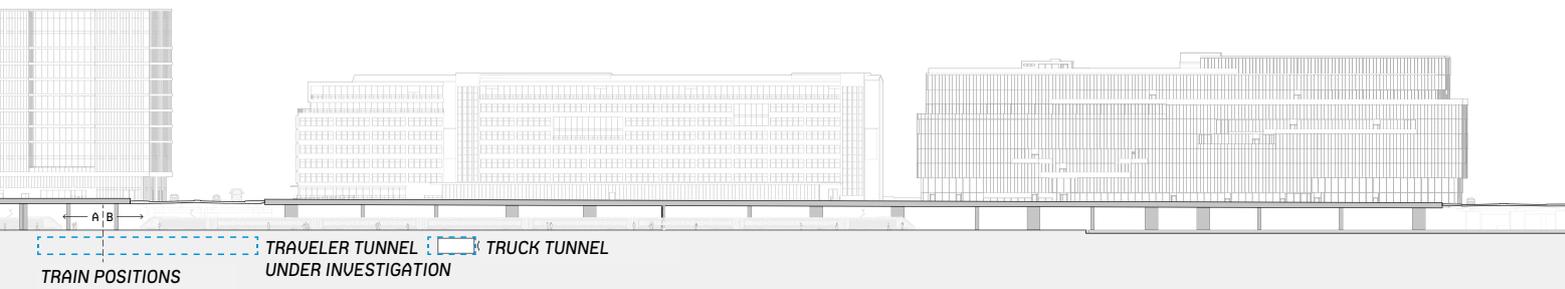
Longitudinal section facing west of Västra Järnvägsgatan, the future decking, new tracks and platforms.
